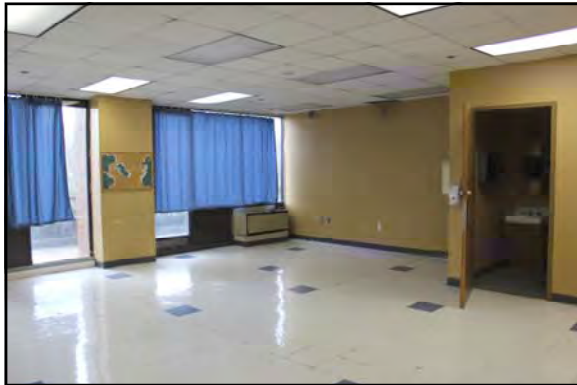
## PHOTOS - MAIN BUILDING "1ST FLOOR"
